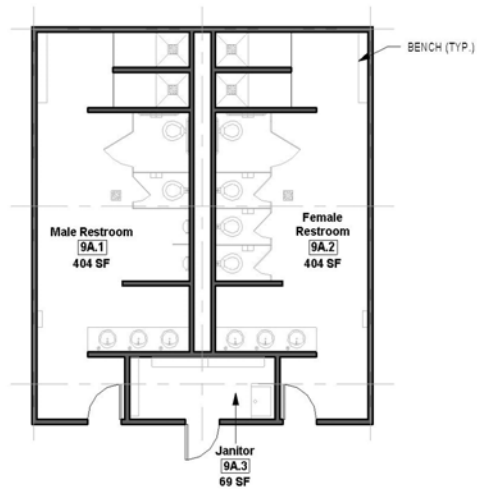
Module 9A: Back of House Restrooms – Floor Plan
